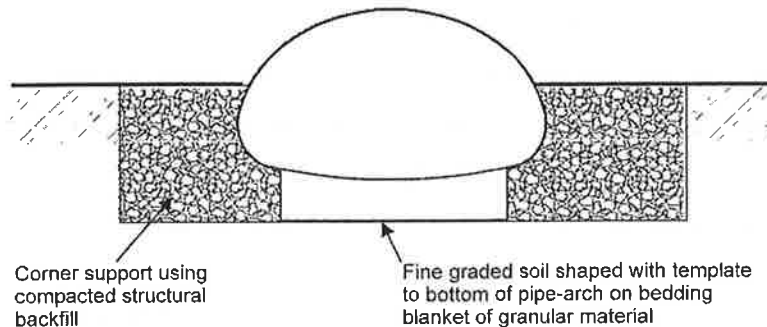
Foundation Treatment for Support of Corner or Side Plate Pressures
